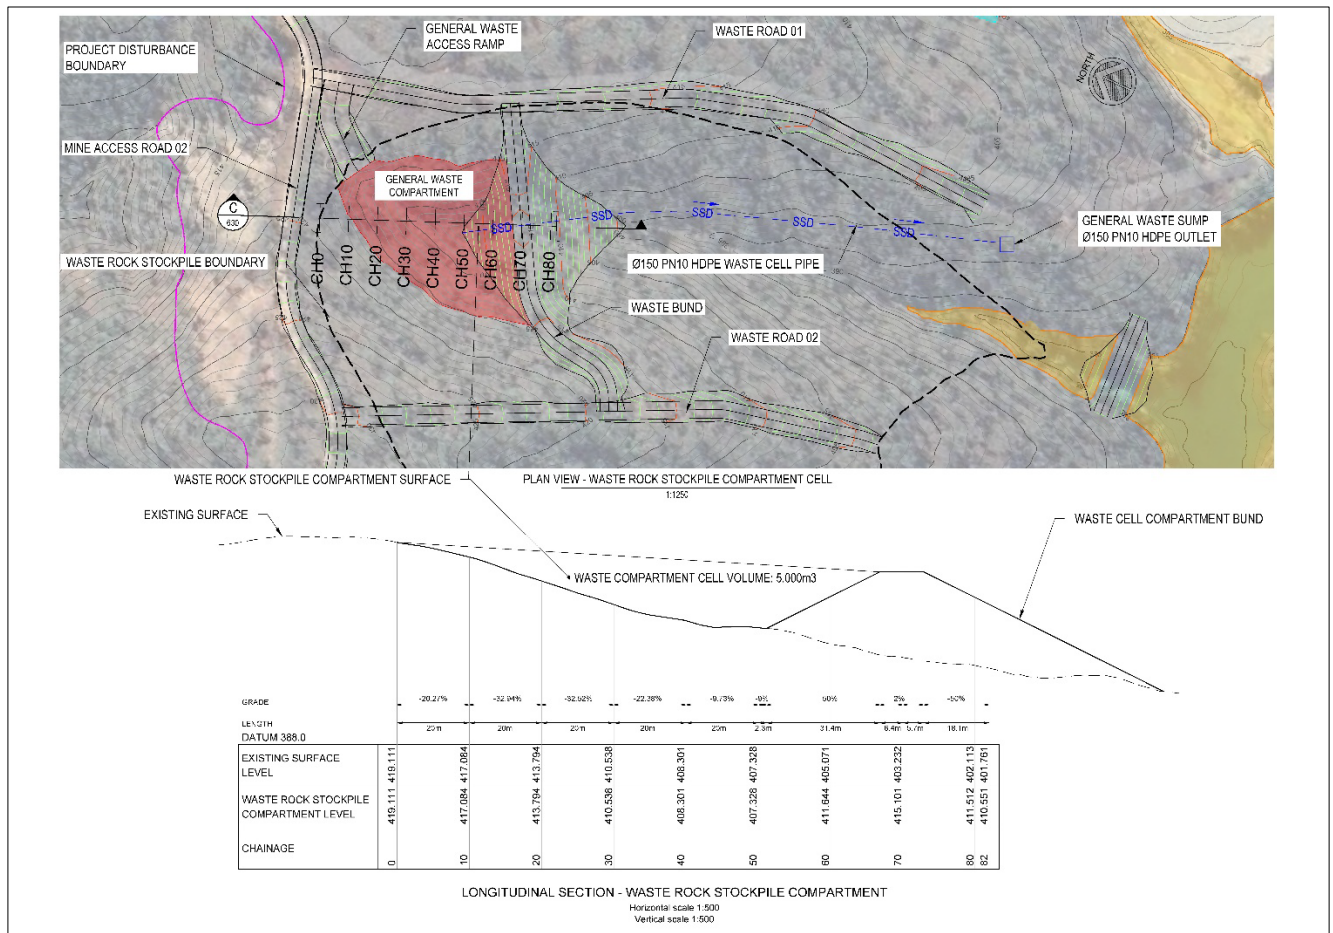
Predicted Landfill Layout - Plan and Cross Section
